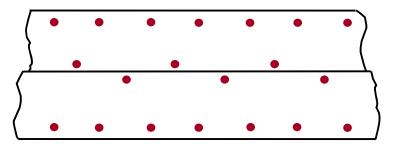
Pattern of grout pumping holes used to correct a settlement.
